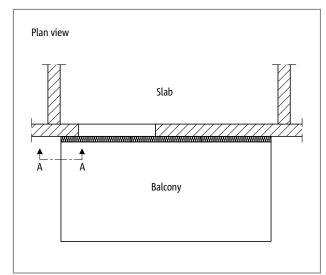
Schöck Isokorb® T type K: Diagram of the position of Section A-A
